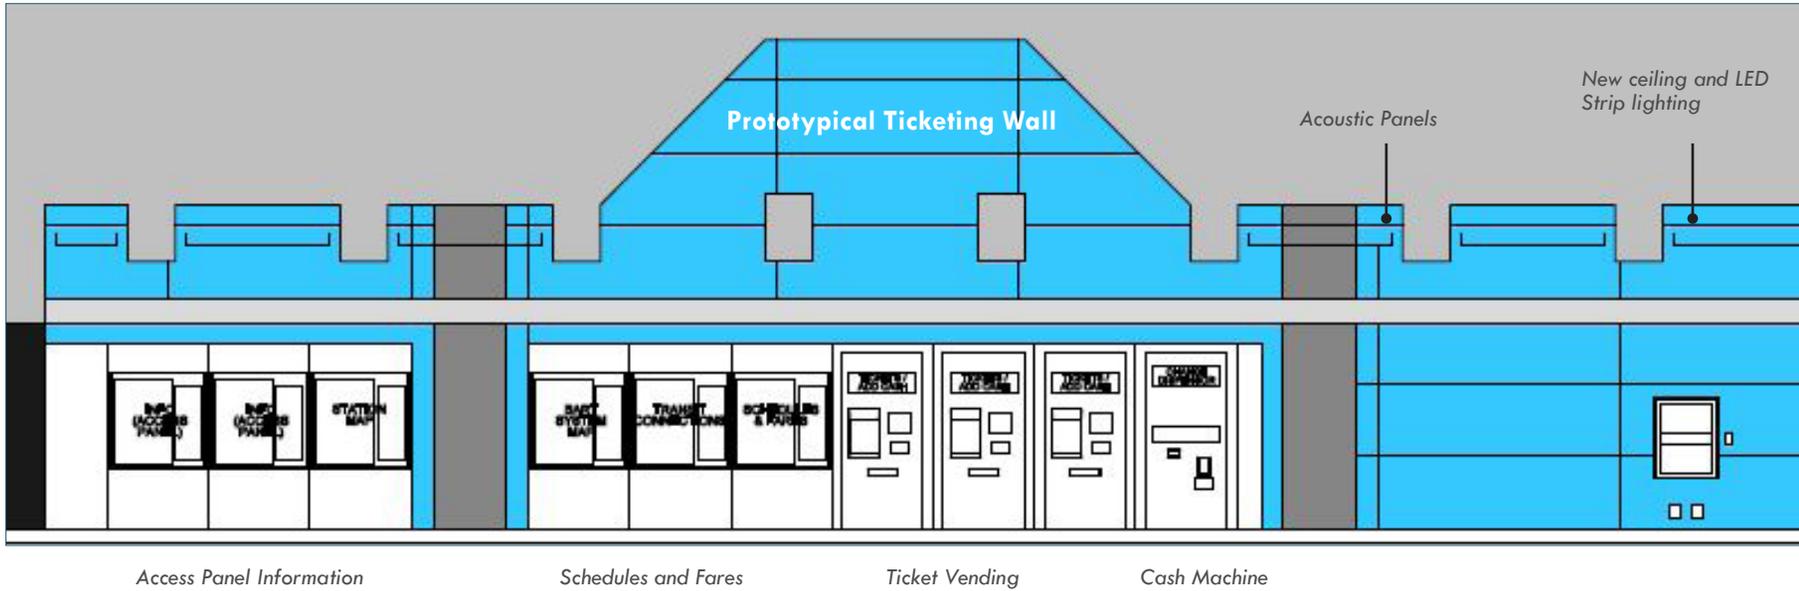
PROTOTYPICAL TICKETING WALL
